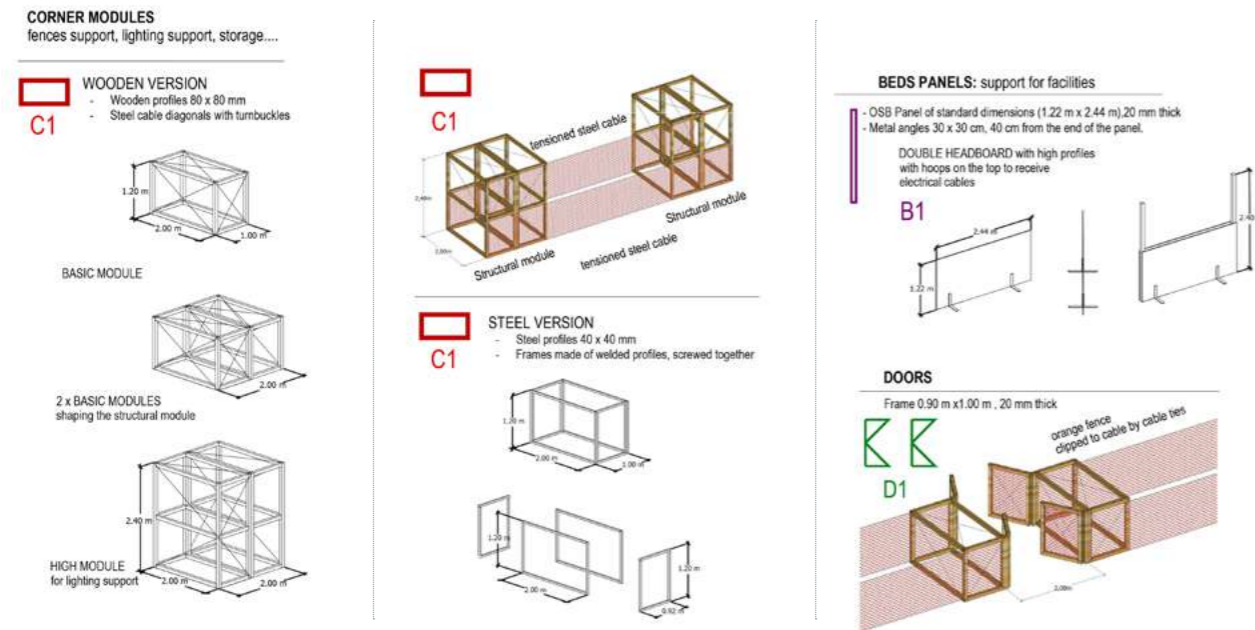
illustrates the recommended building sequence, constructive elements, and scaled gridded plans that detail module construction. Measurement tools such as surveyors' tape and/or laser measurement tools can be utilized to adapt the illustrated layouts to identified locations and facilitate site clearing and levelling if required in outdoor settings. Preparation of land will facilitate the subsequent phases of the work, such as water drainage and assembly of tents and structures, etc.
